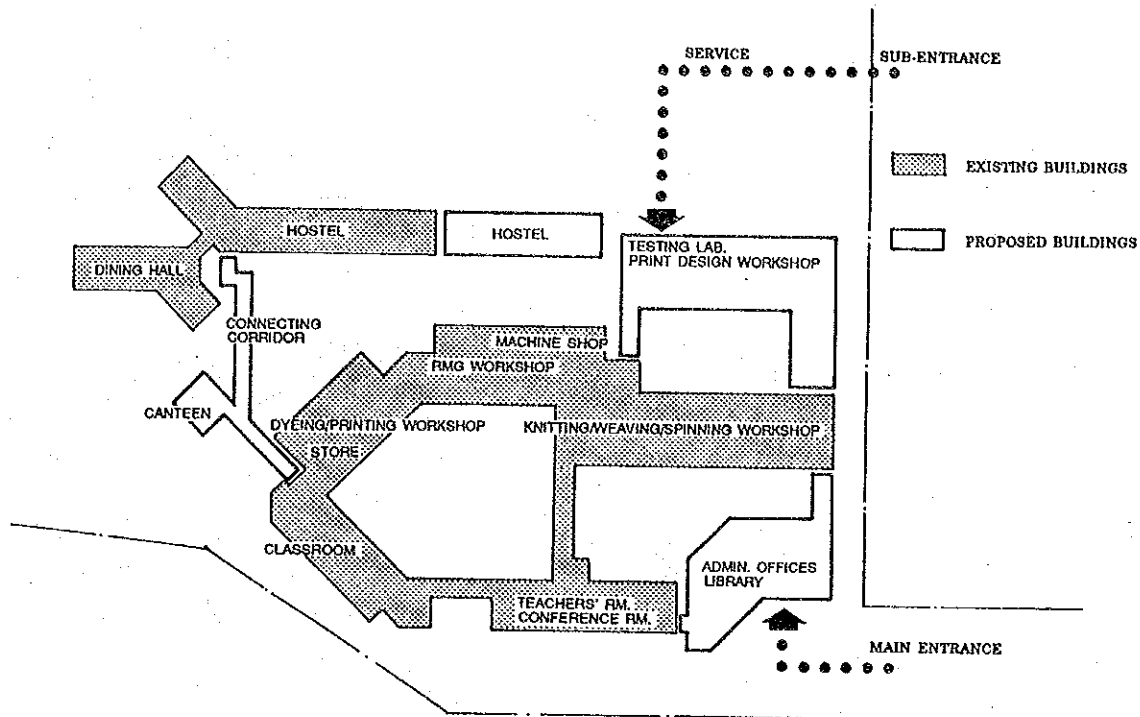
Existing Facilities Utilization Plan/Building Layout Plan
